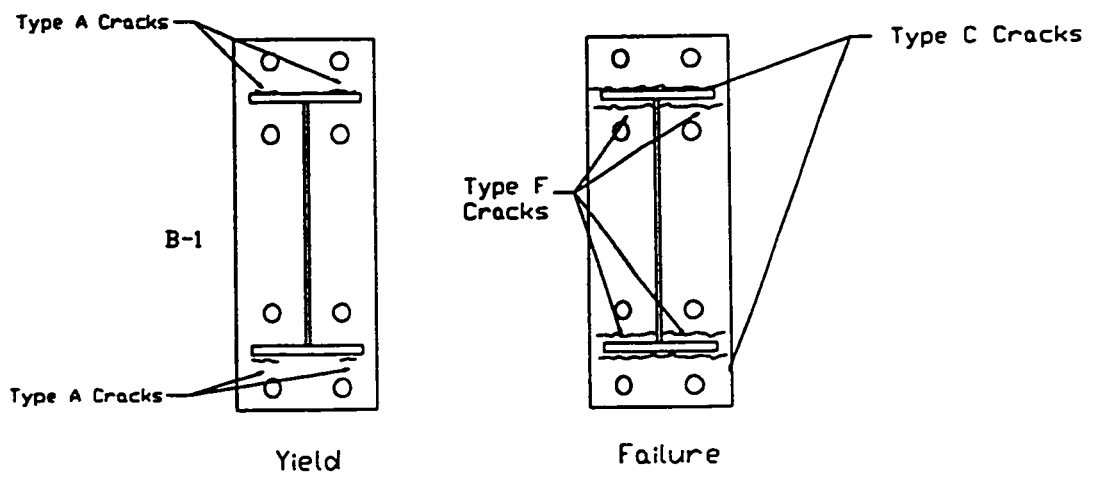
Crack Locations at Yield and Failure for Connection B-1
